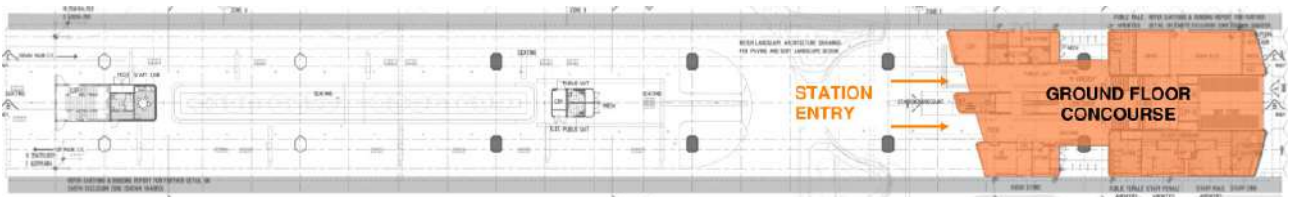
PROPOSED WORKS (GROUND FLOOR CONCOURSE)
